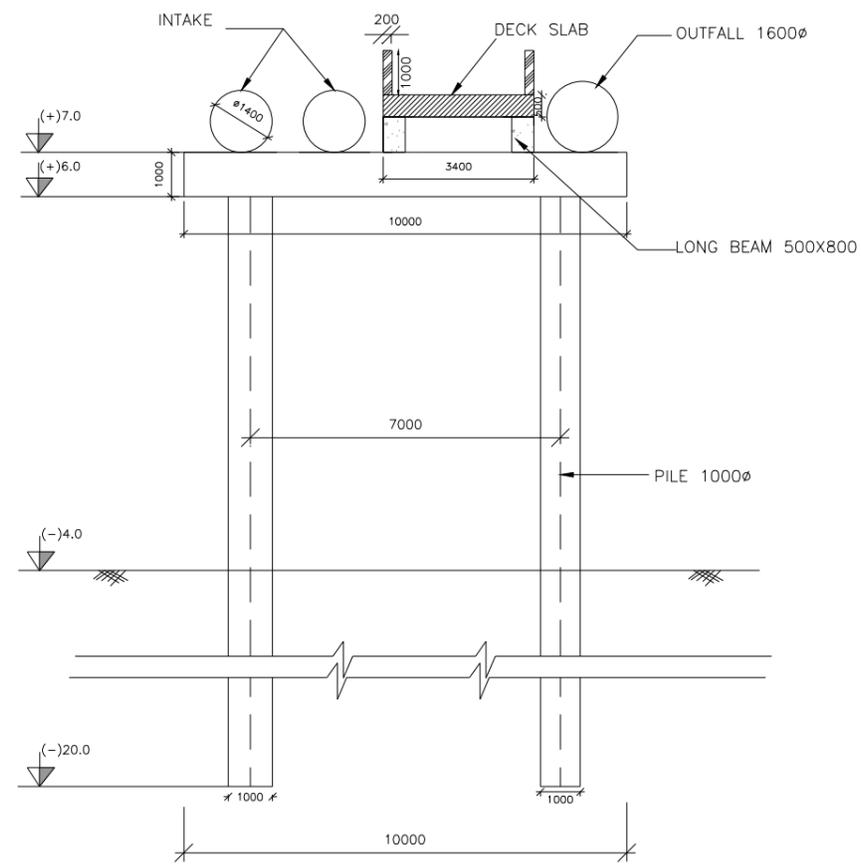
Details of Outfall structure and Jetty supporting Outfall pipeline.
